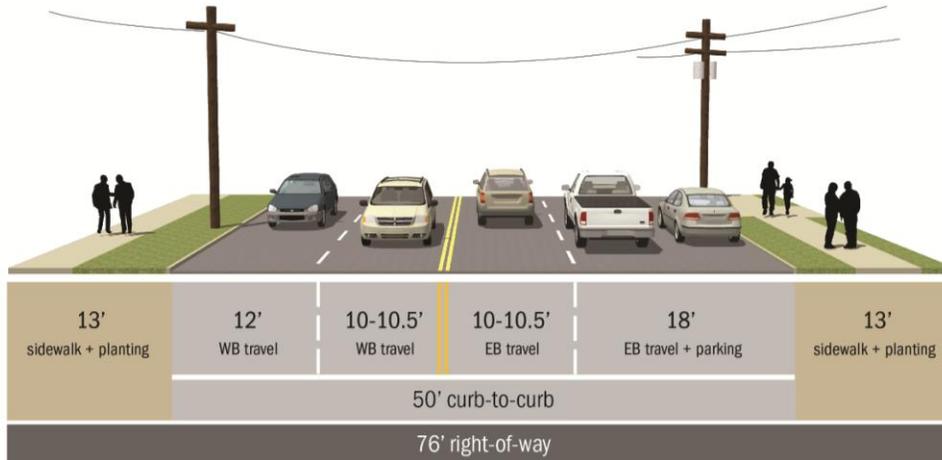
Existing cross section – SE 80th Avenue to SE 87th Avenue
